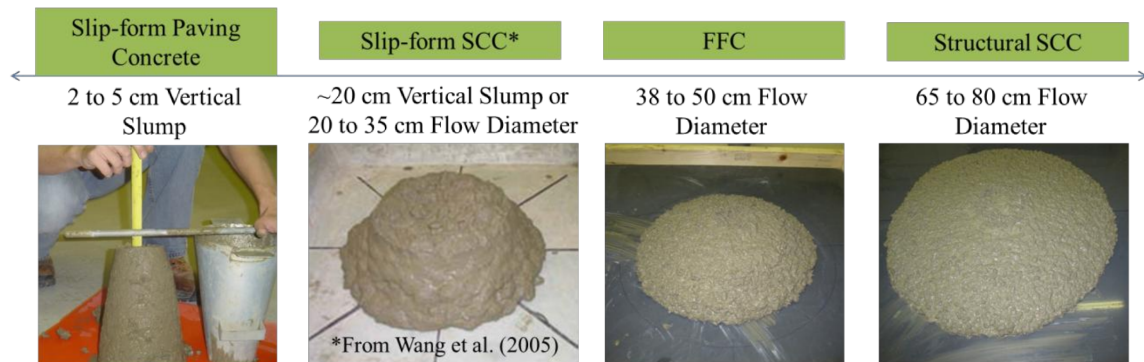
Example images and desired slump measurements from slip-form concrete paving to structural SCC.
